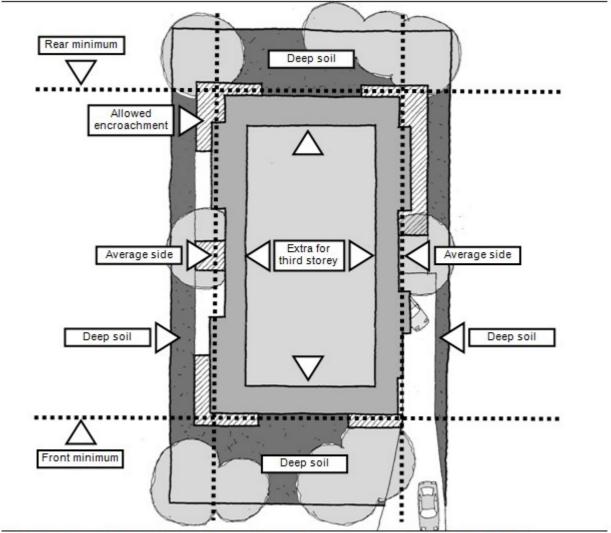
SETBACKS + DEEP SOIL: RESIDENTIAL FLAT BUILDINGS Indicative site plan for developments with below-ground parking
